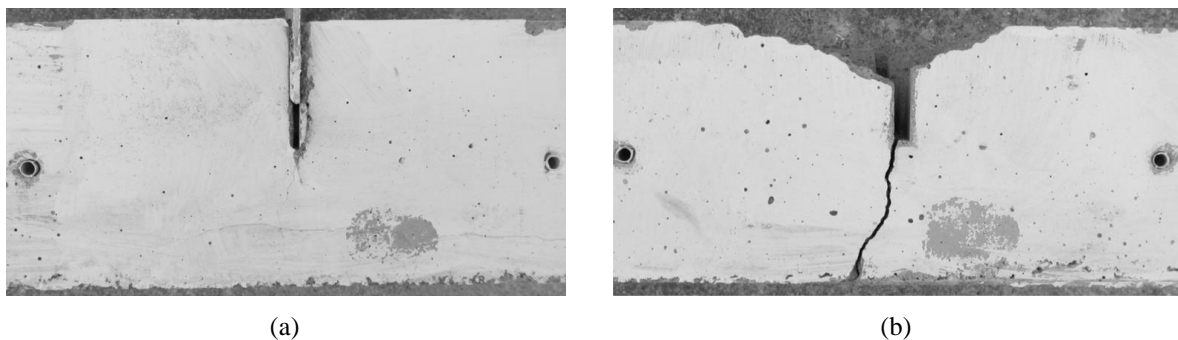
Detail of typical vertical cracking of concrete blocks: (a) 3H-CSM-SFRSCC and (b) 3H-CSM-SCC.
